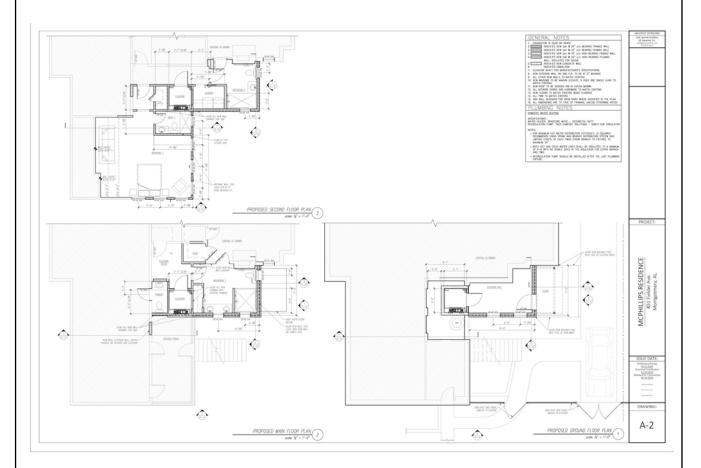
Proposed new floor plans (all levels) for 831 Felder Ave.
